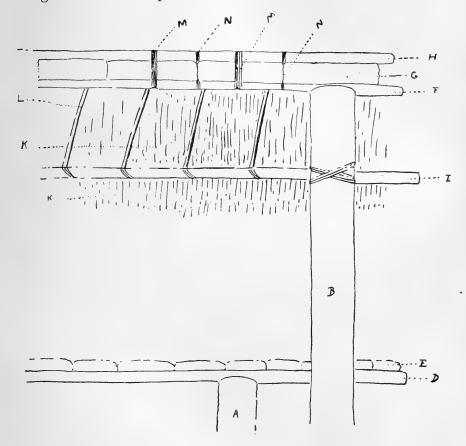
VIEW OF A HOUSE IN VERTICAL SECTION from within, showing construction of lower and upper floor.
